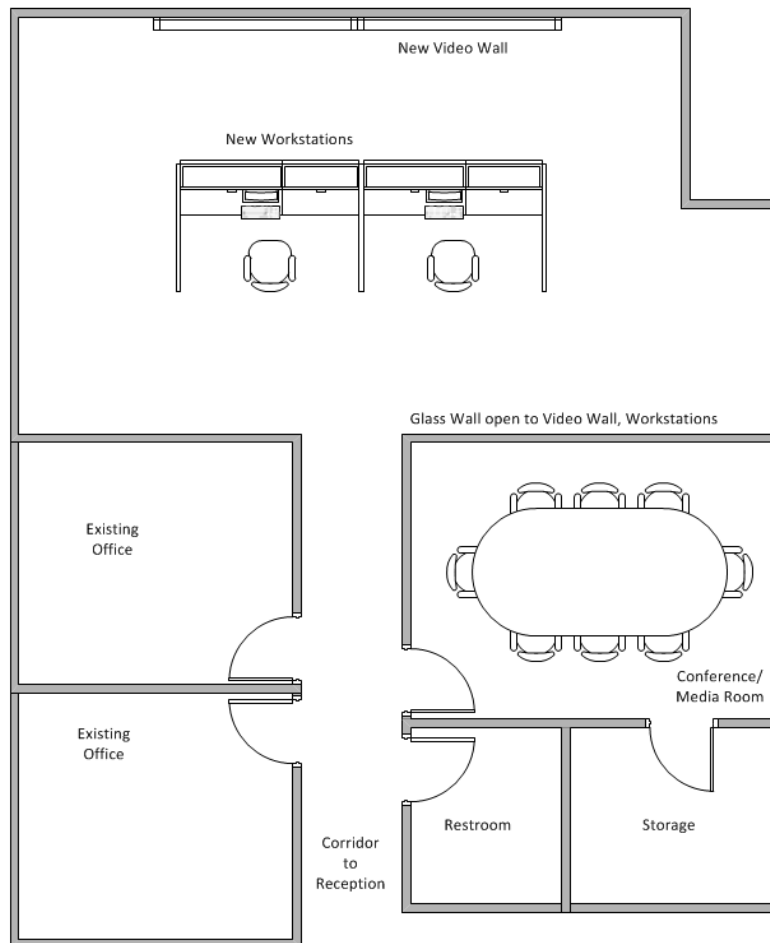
POTENTIAL FLOOR PLAN AT TRAFFIC MAINTENANCE FACILITY
